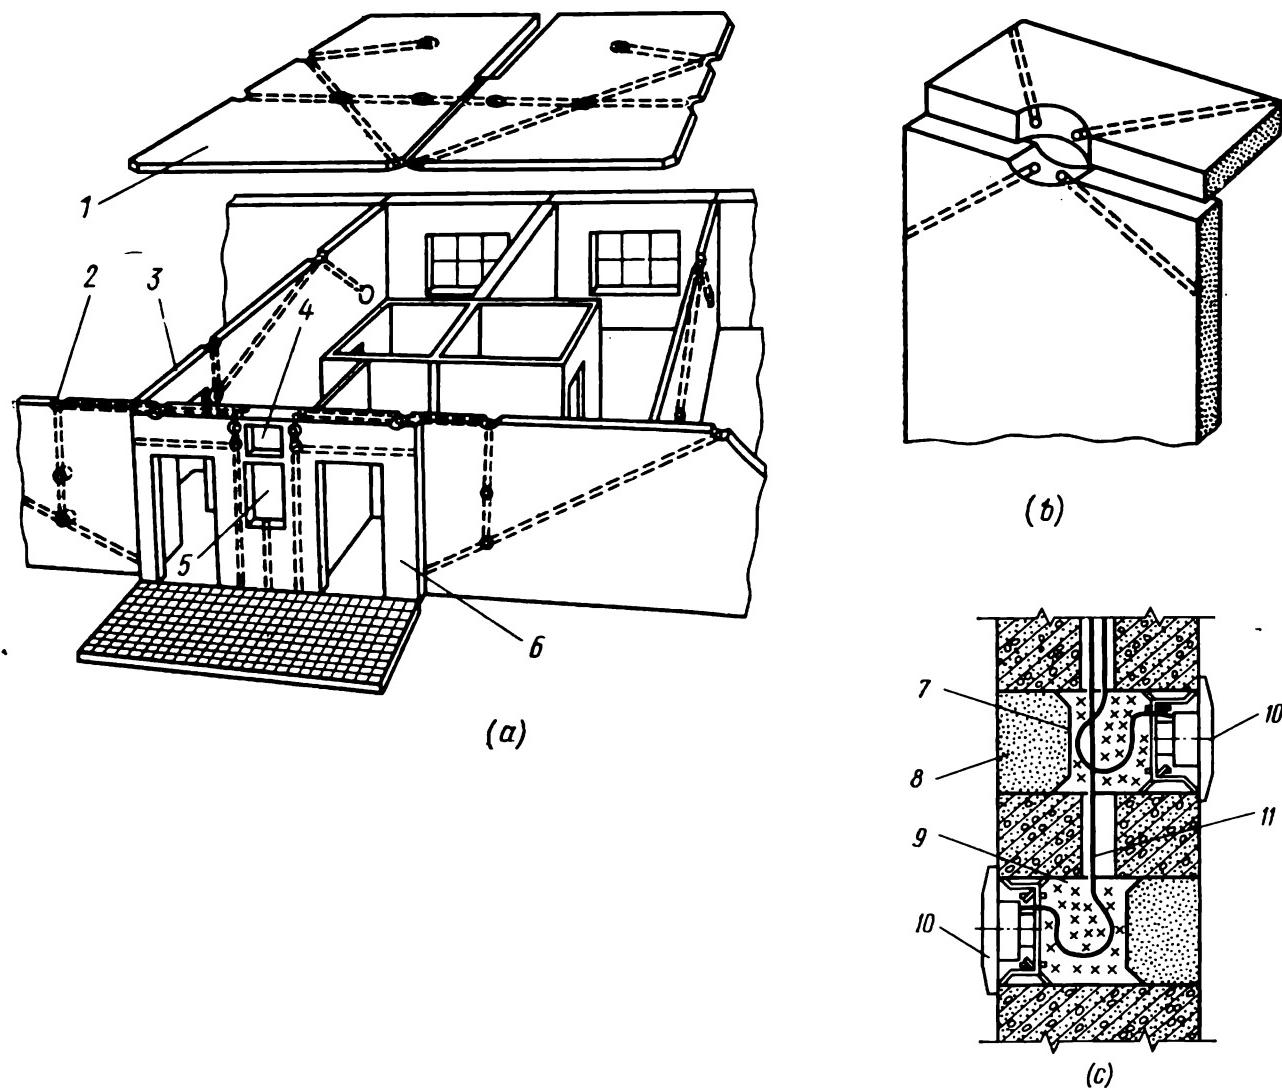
Construction of a large-panel dwelling house with a raceway wiring system
